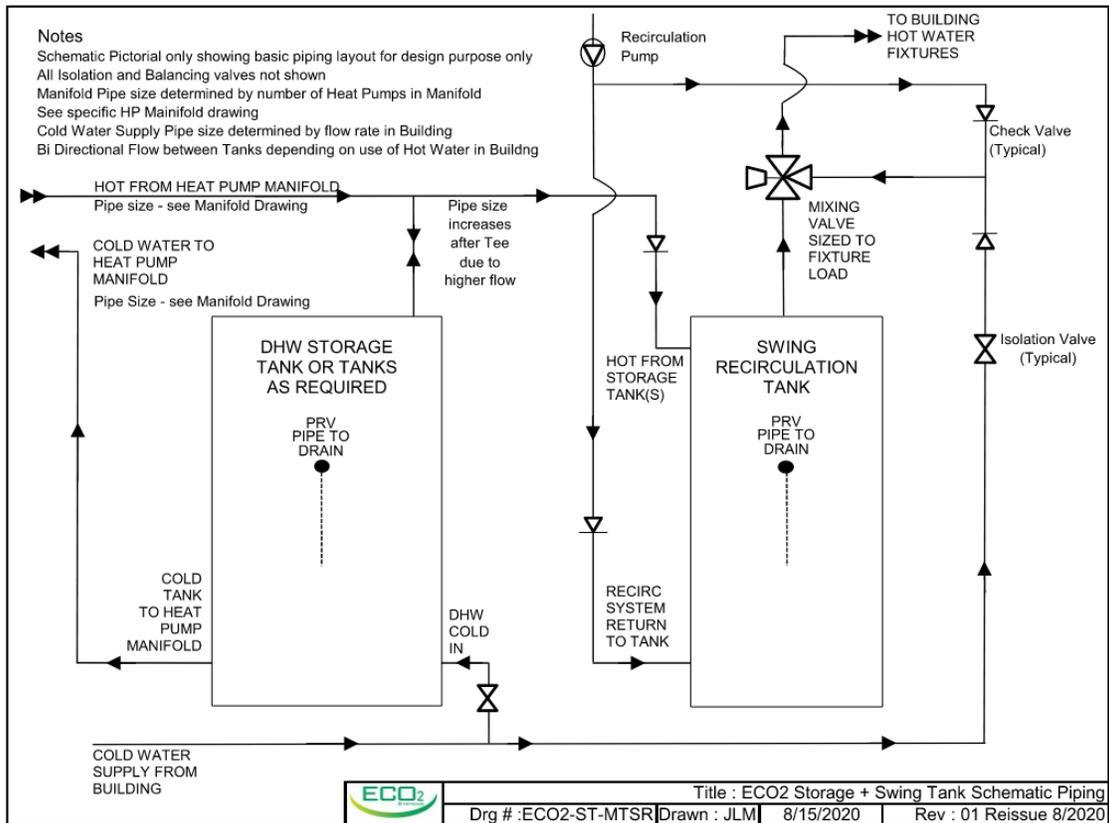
Small Planet Supply Typical Swing Tank Arrangement
